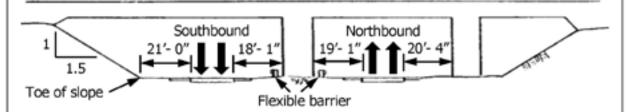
Bridge elevation view of horizontal clearances for separate southbound and northbound highway features below the bridge, with flexible barriers.
